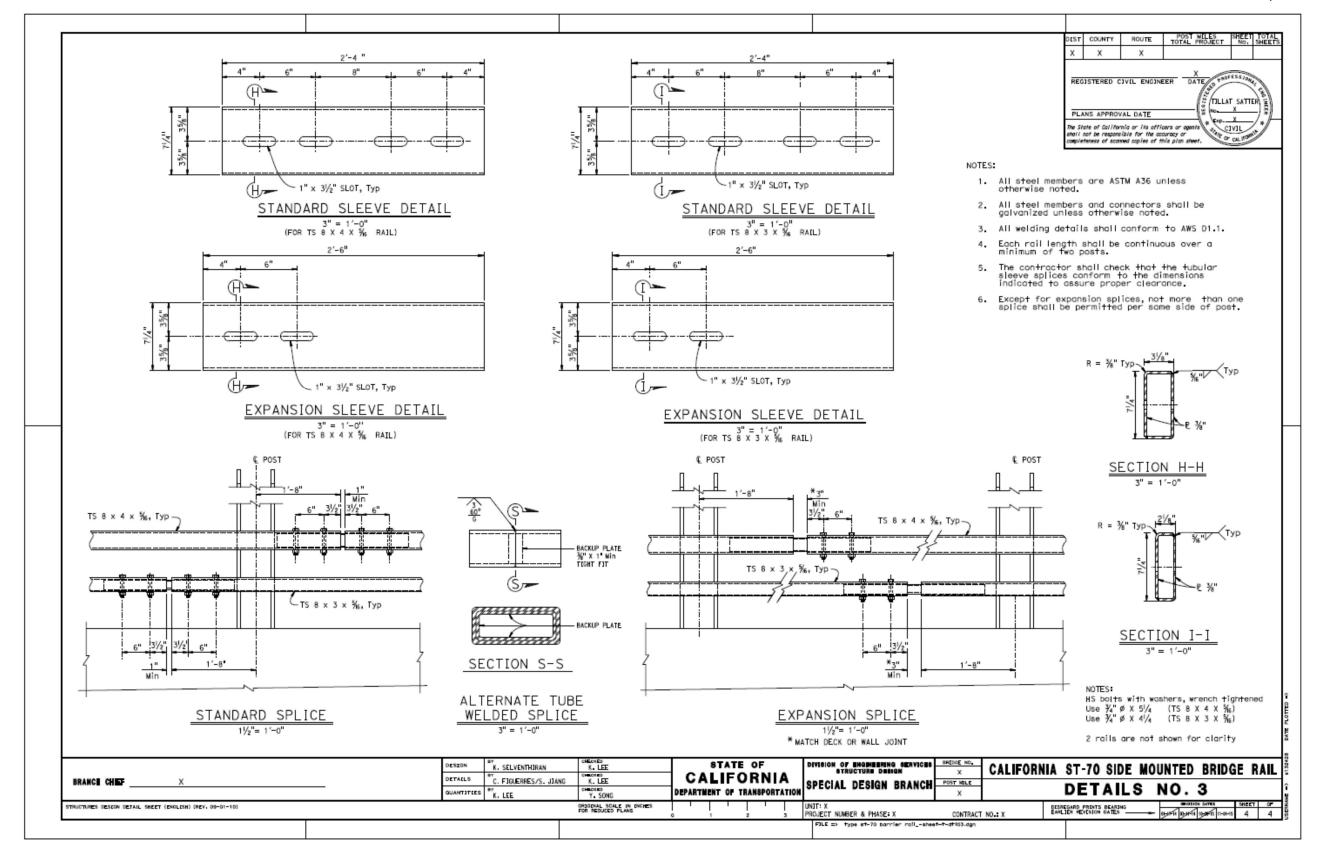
CA ST-70SM Side Mounted Bridge Rail (Details Page 3)
